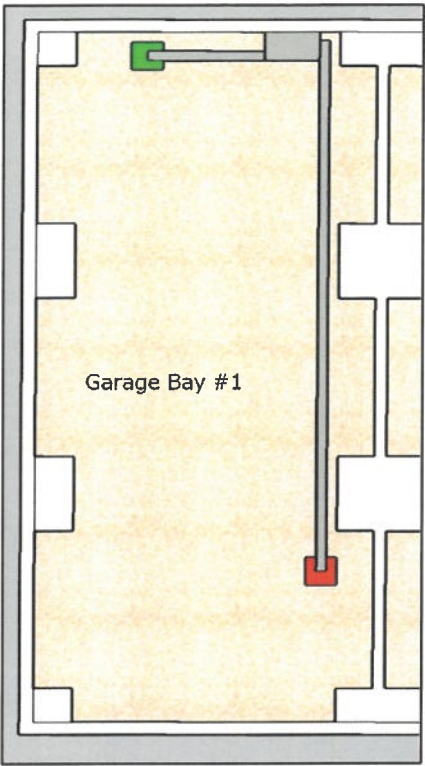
Isolated view of Garage Bay #1 showing recommended layout for HRV ducts.
